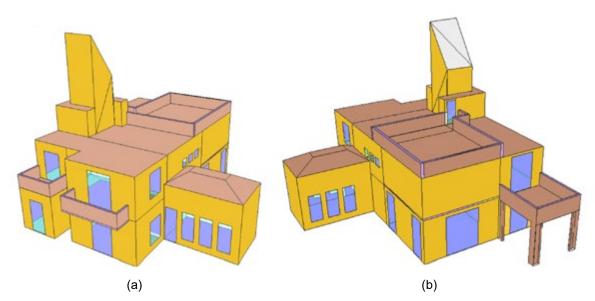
3D architectural sketches of the studied house: (a) North-East sight, (b) South-East sight [2]
